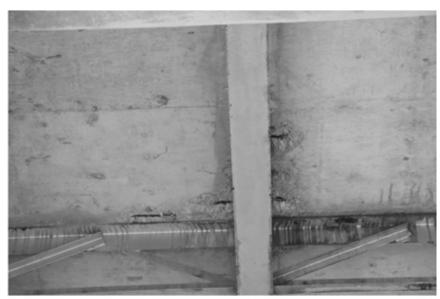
SPALLS IN DECK SOFFIT IN SPAN 1 FROM SOUTHWEST, LOOKING SOUTHWEST.
